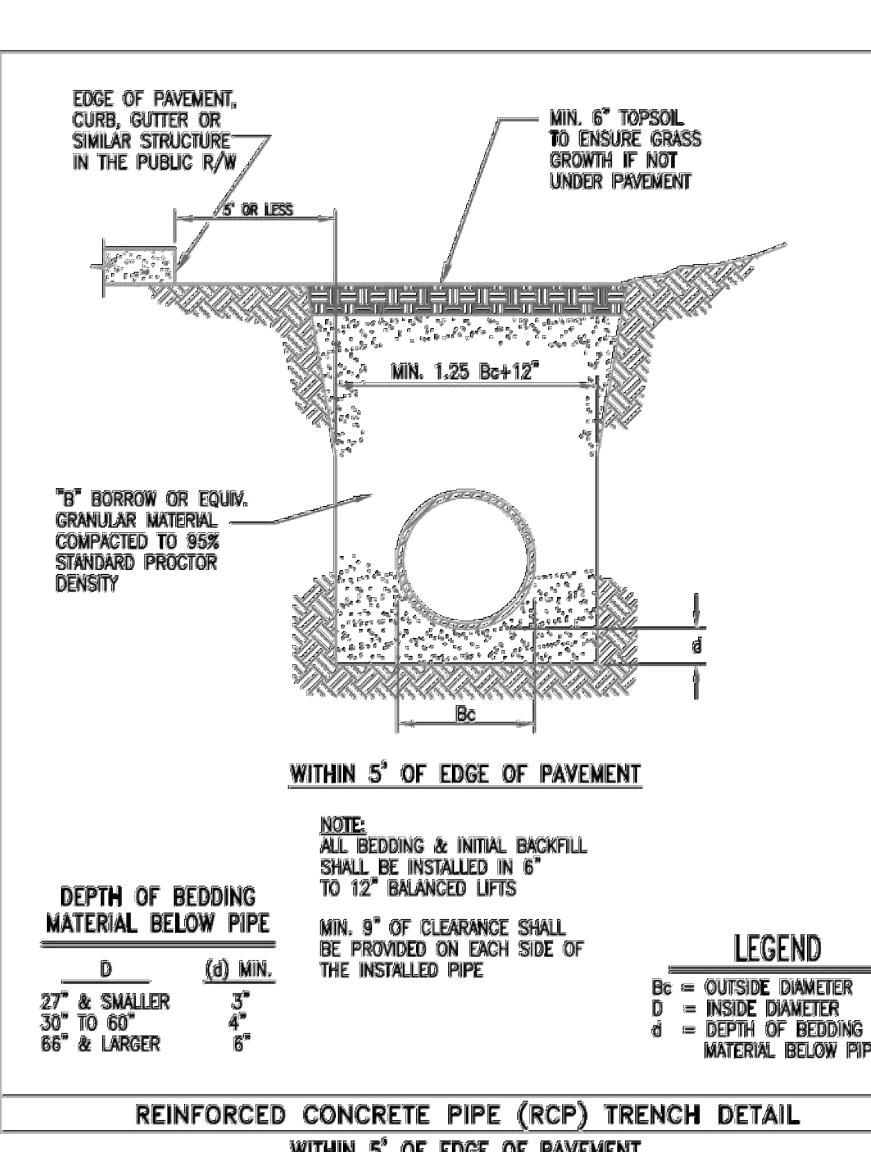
Reinforced Concrete Pipe (RCP) Trench Detail - within five feet of edge of pavement
